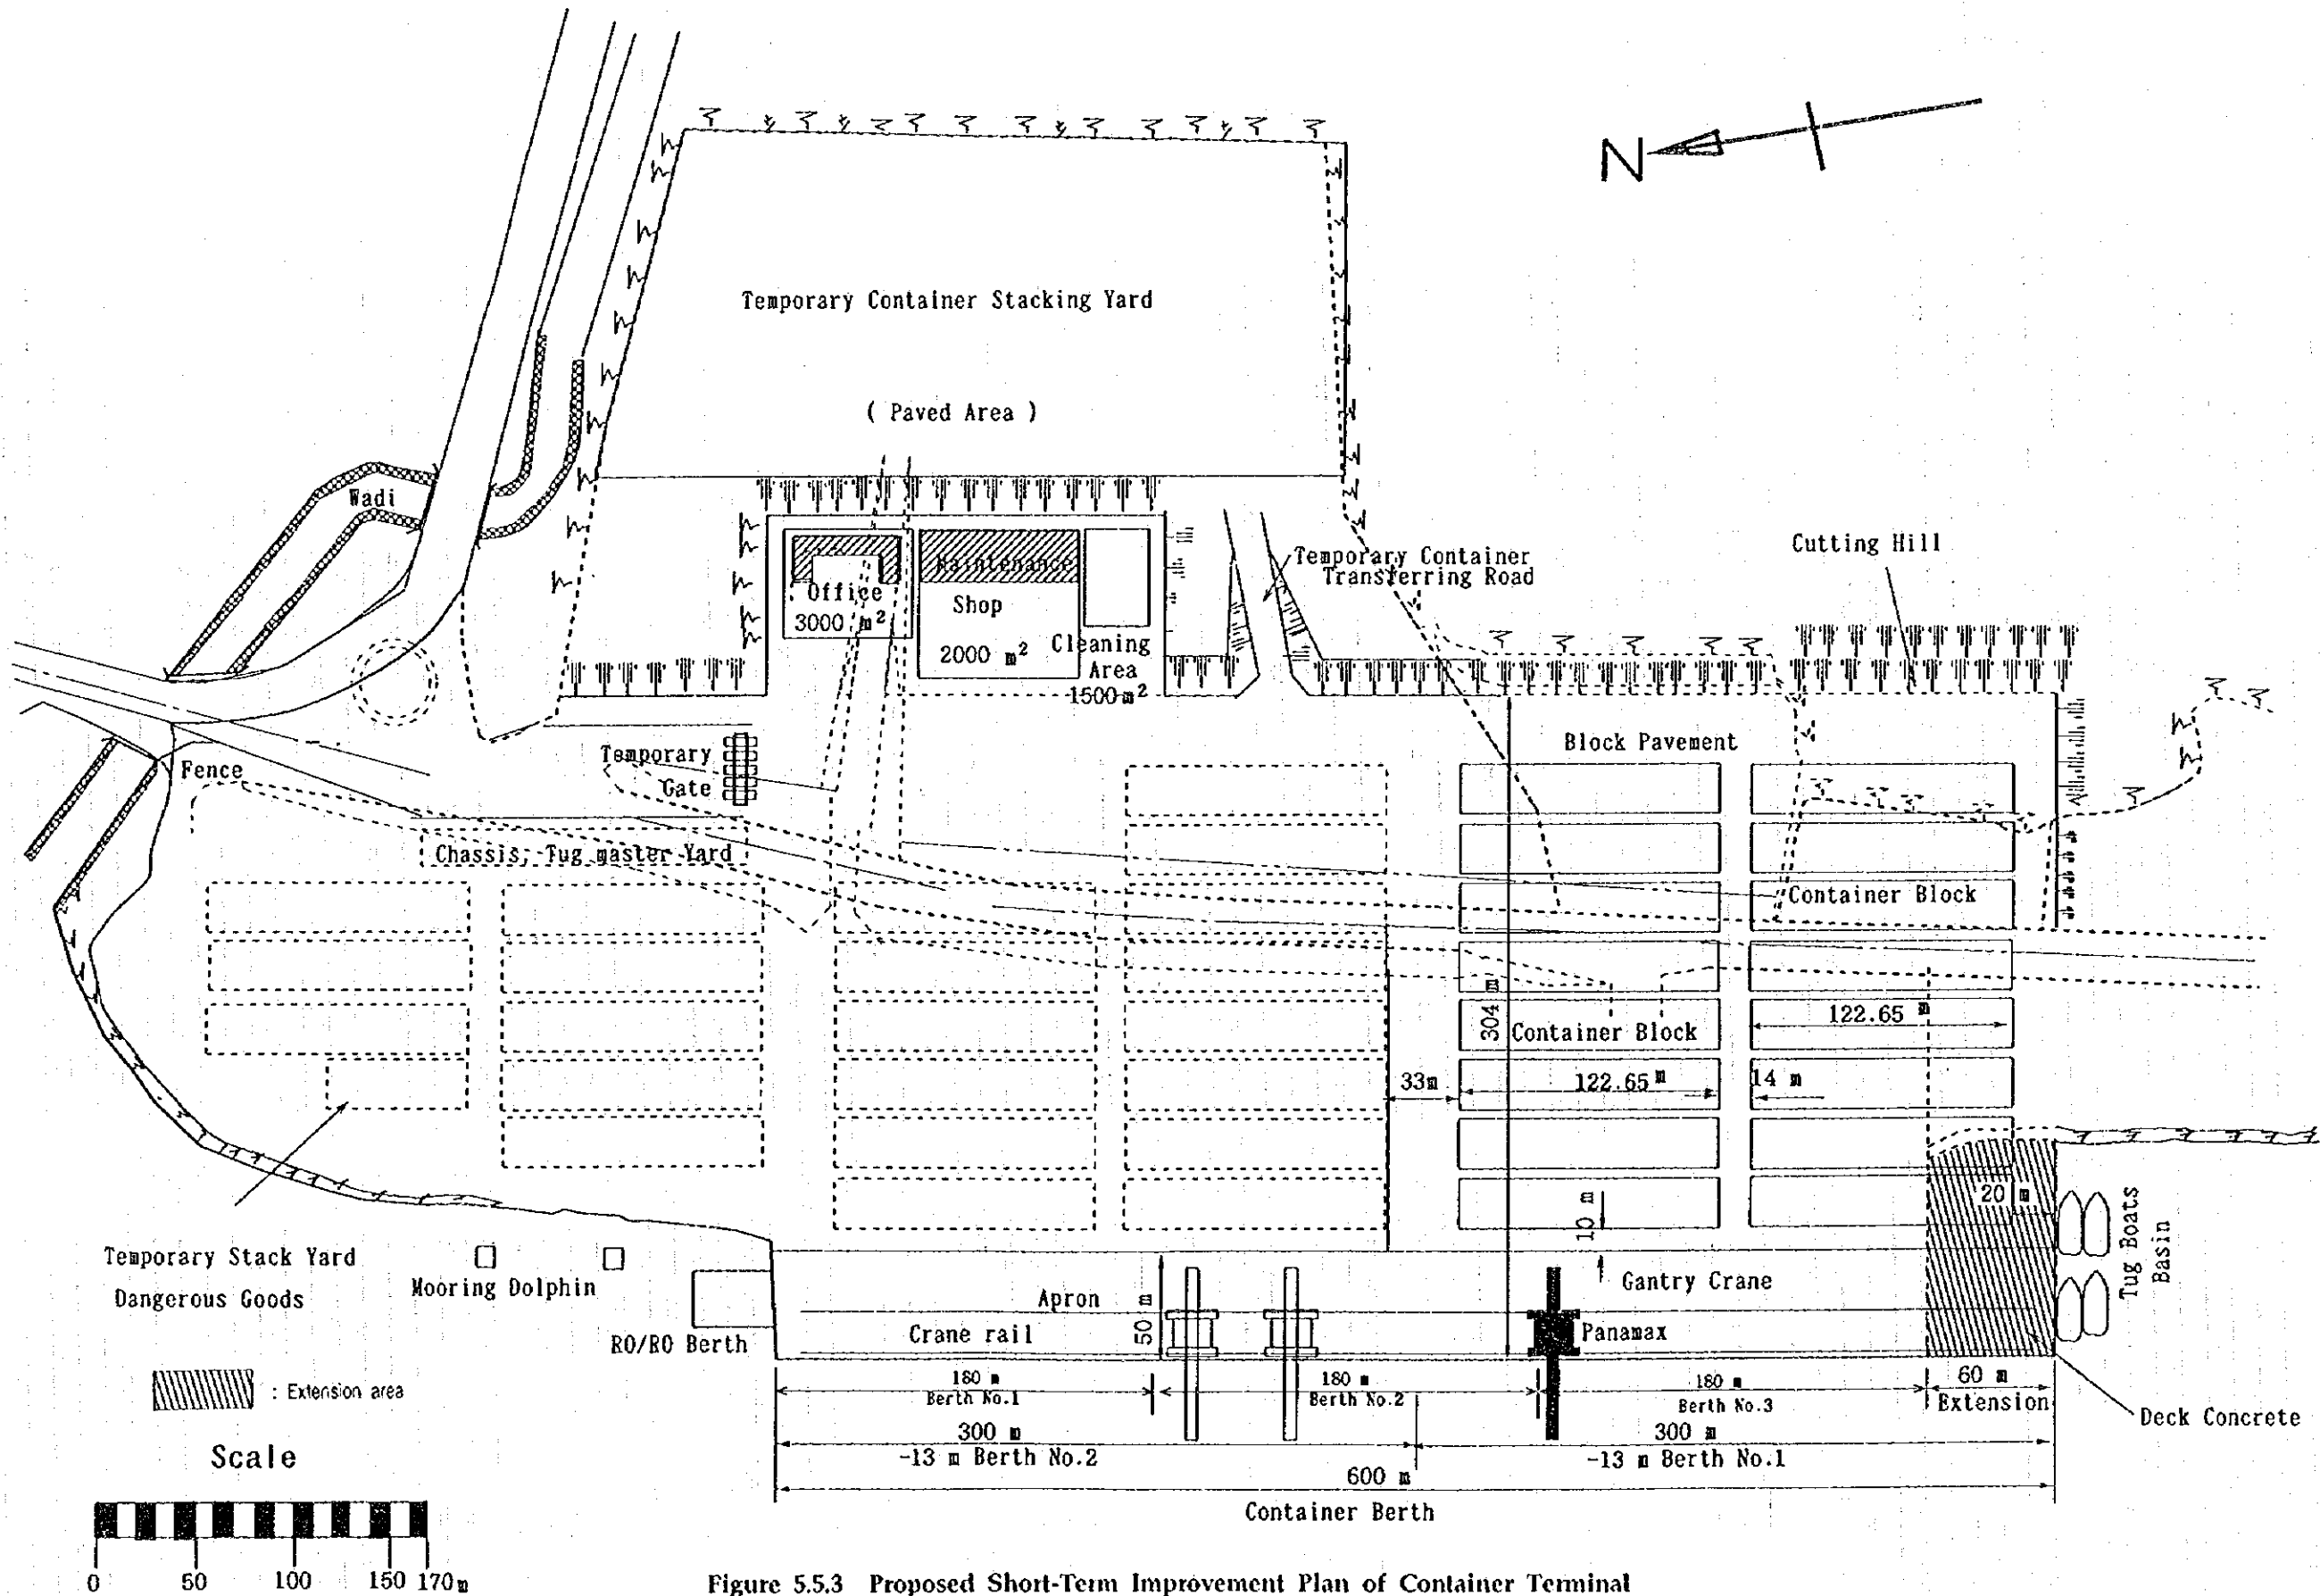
Proposed Short-Term Improvement Plan of Container Terminal
